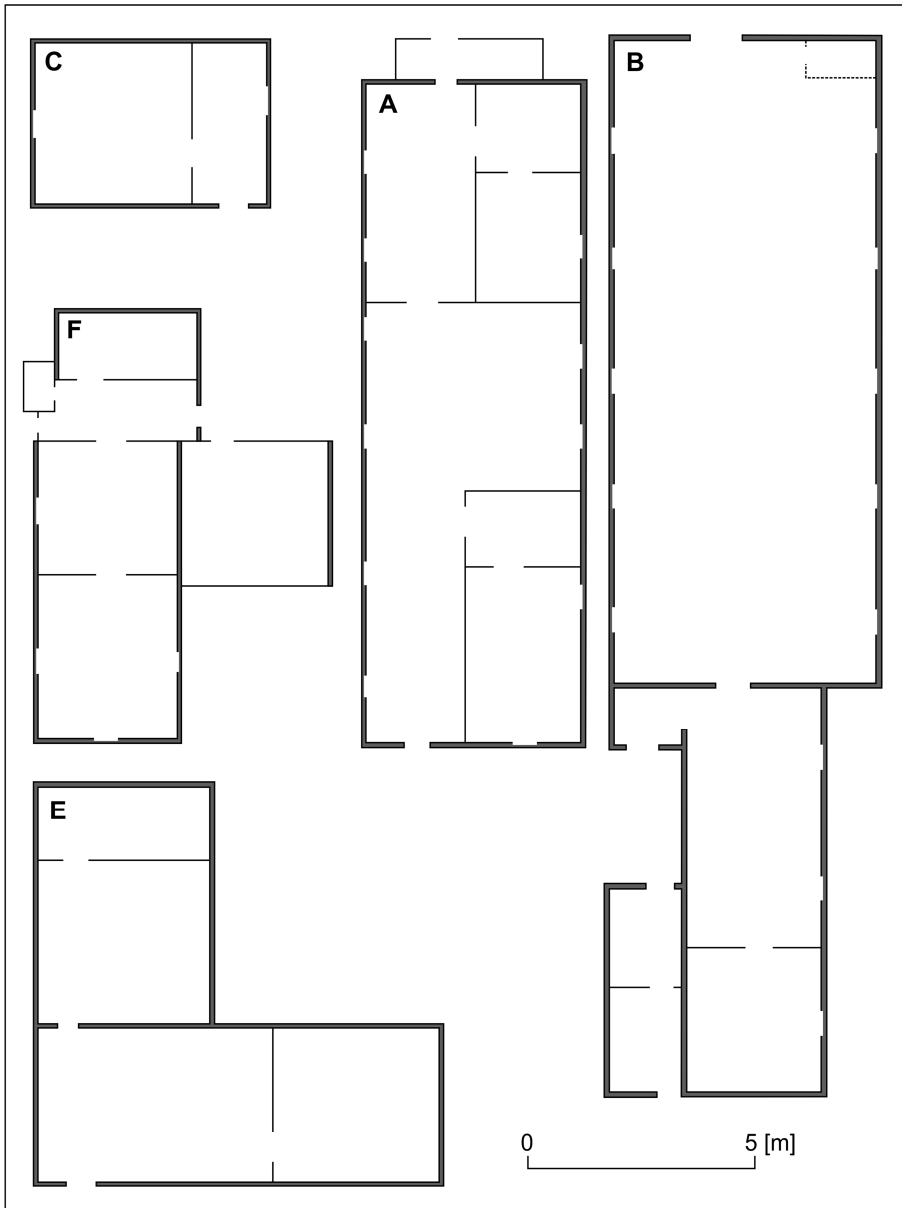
Plans for the main buildings of Calypsobyen - explanation in the text (after: Krawczyk & Reder 1989).
